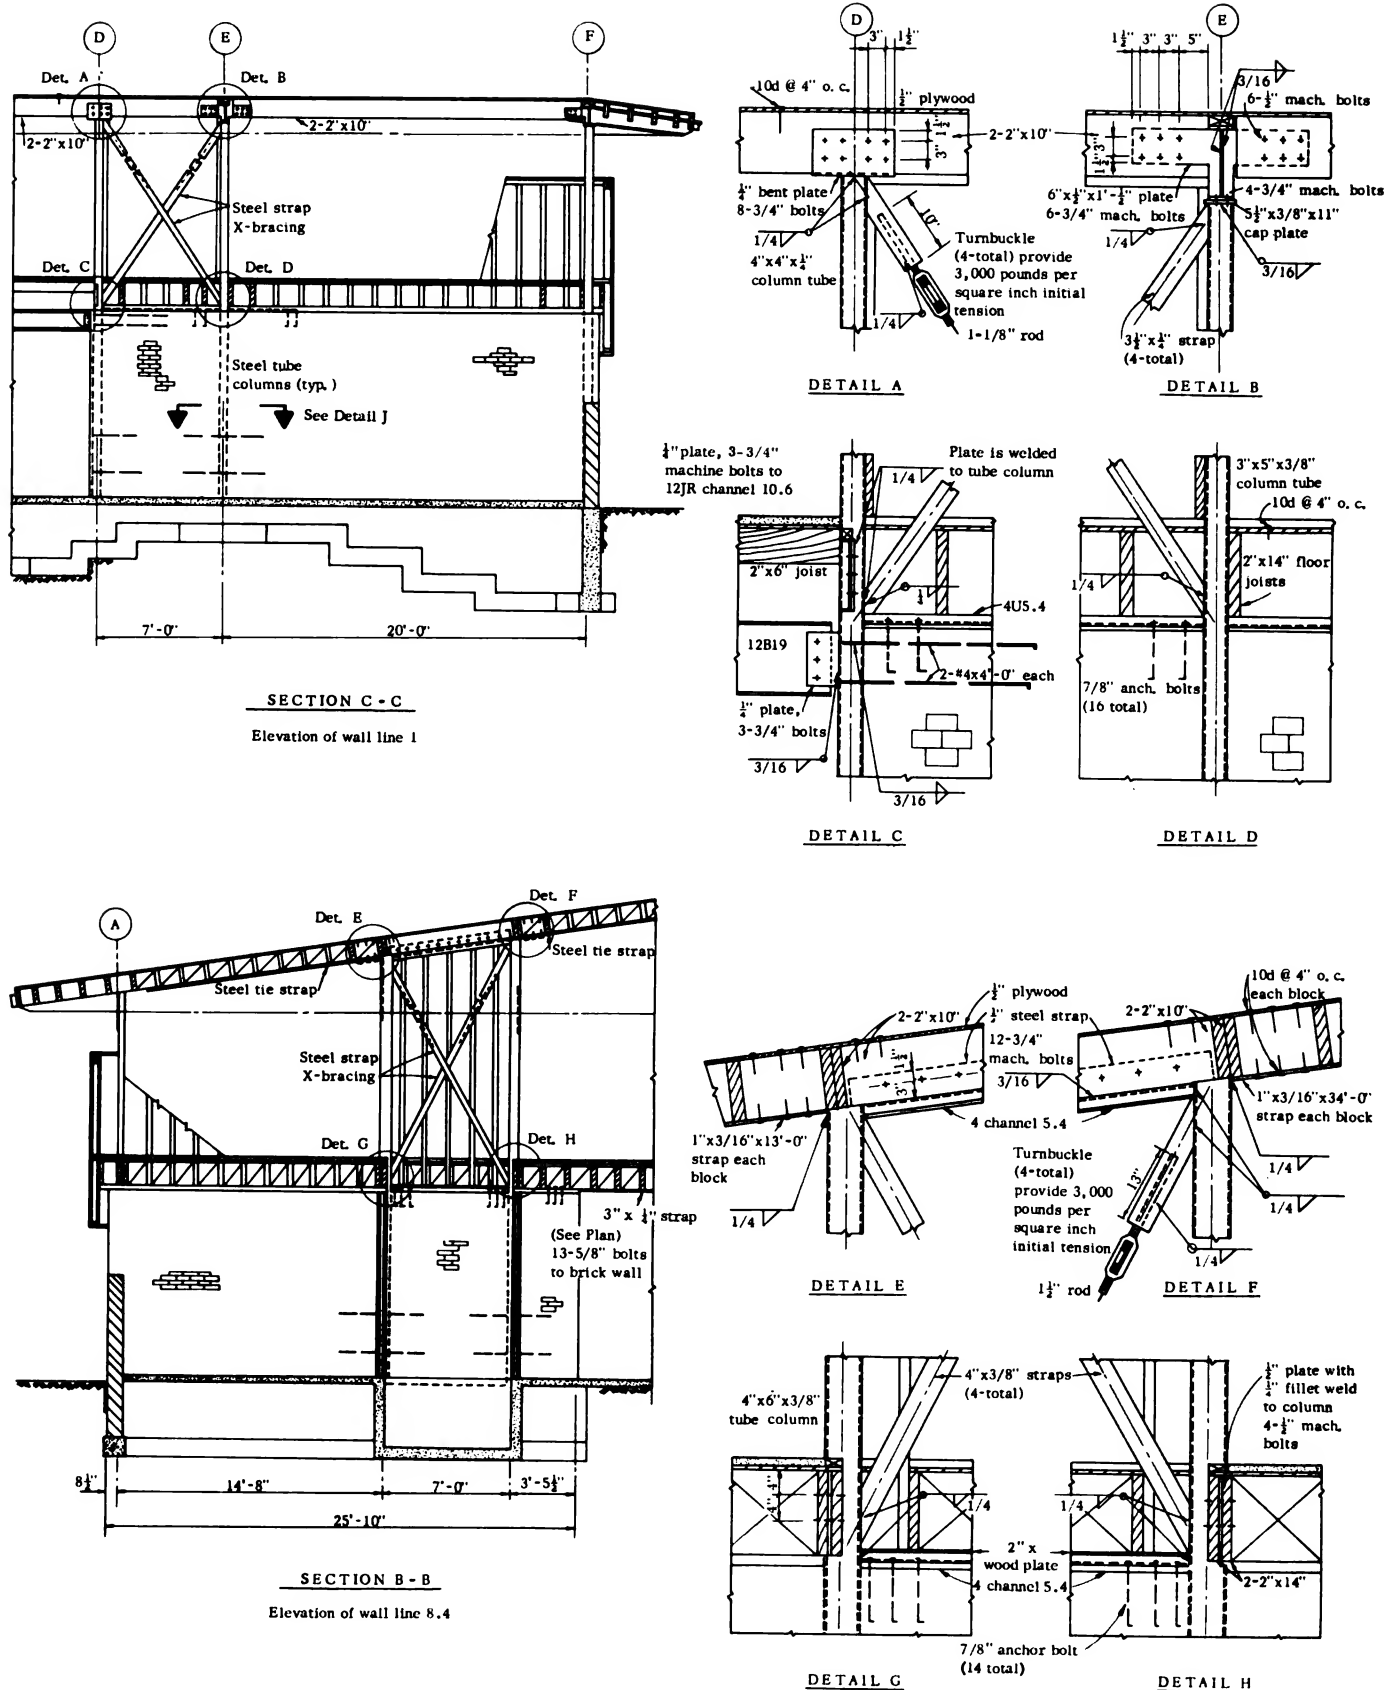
Pacoima Lutheran Medical Center. Elevation of wall lines 1 and 8.4.
